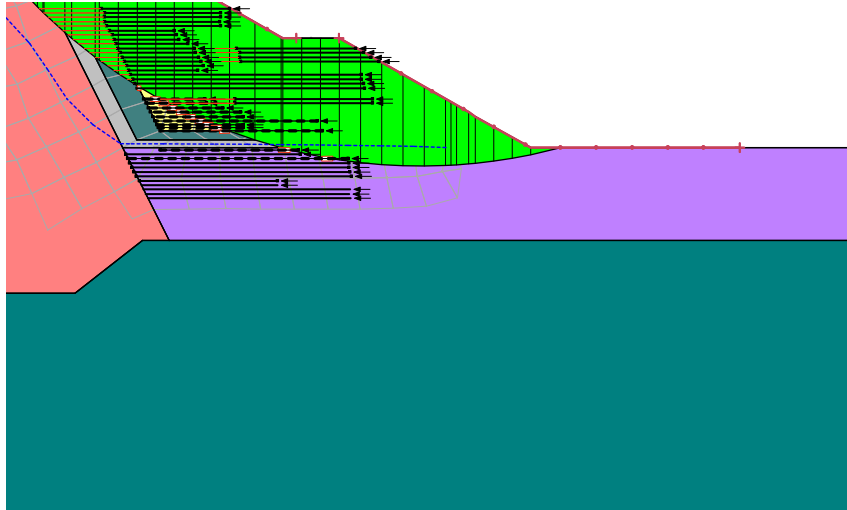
Detail D: shows intersection of critical failure surface and reinforcement (1.75H: 1V)
